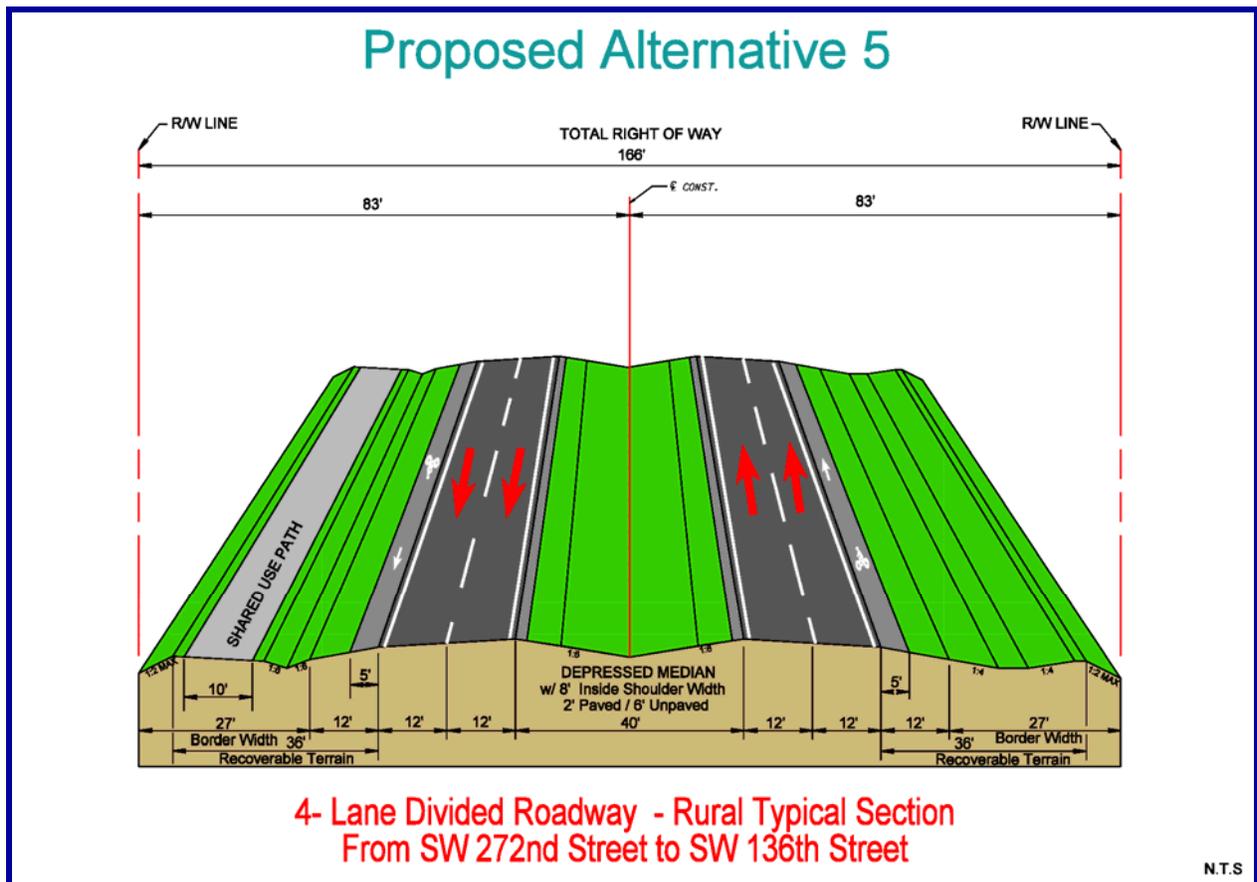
Alternative 5 Proposed Typical Roadway Section (Rural)
